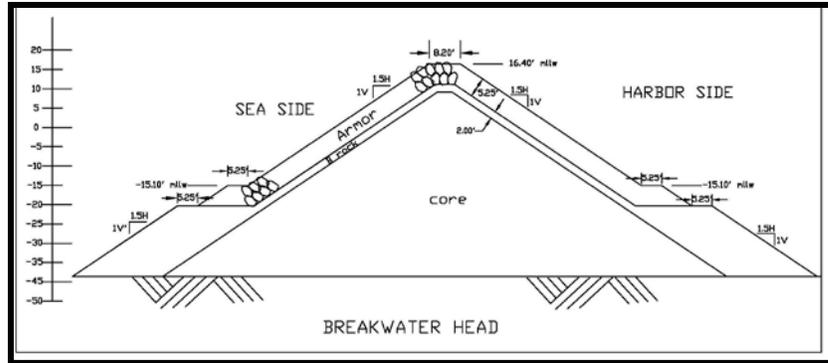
Breakwater cross section of the extension off the South Breakwater towards Japonski Island.
